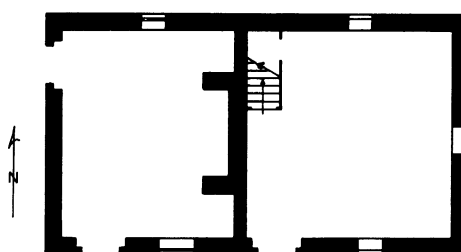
Fort Philip Long. Subsidiary building, first-floor plan.
